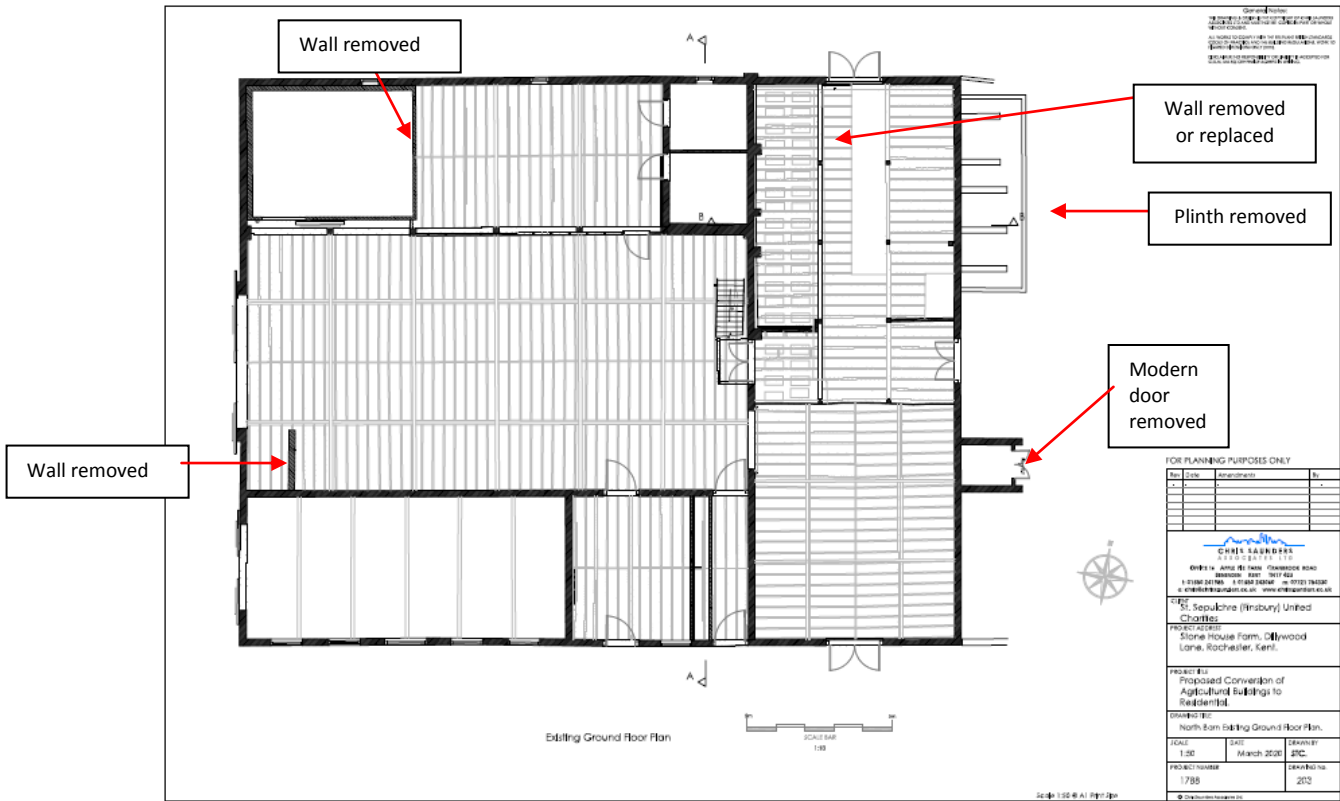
Existing ground floor plan ©Chris Saunders Associates Ltd. drawing number: 1788/203.
